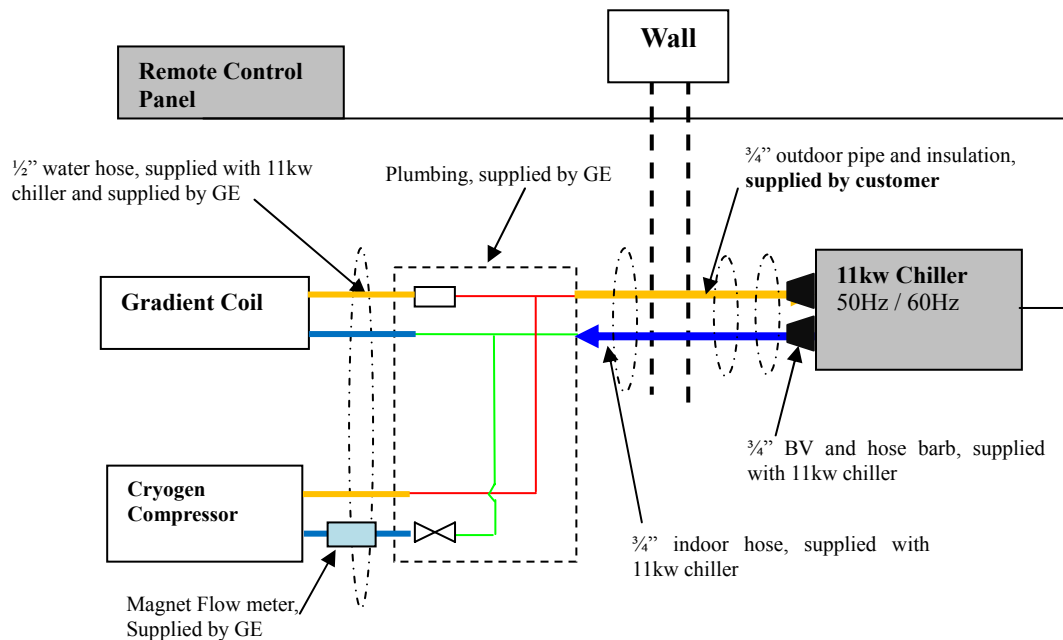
Outdoor Piping/Hose Connection for Cooling Type C
